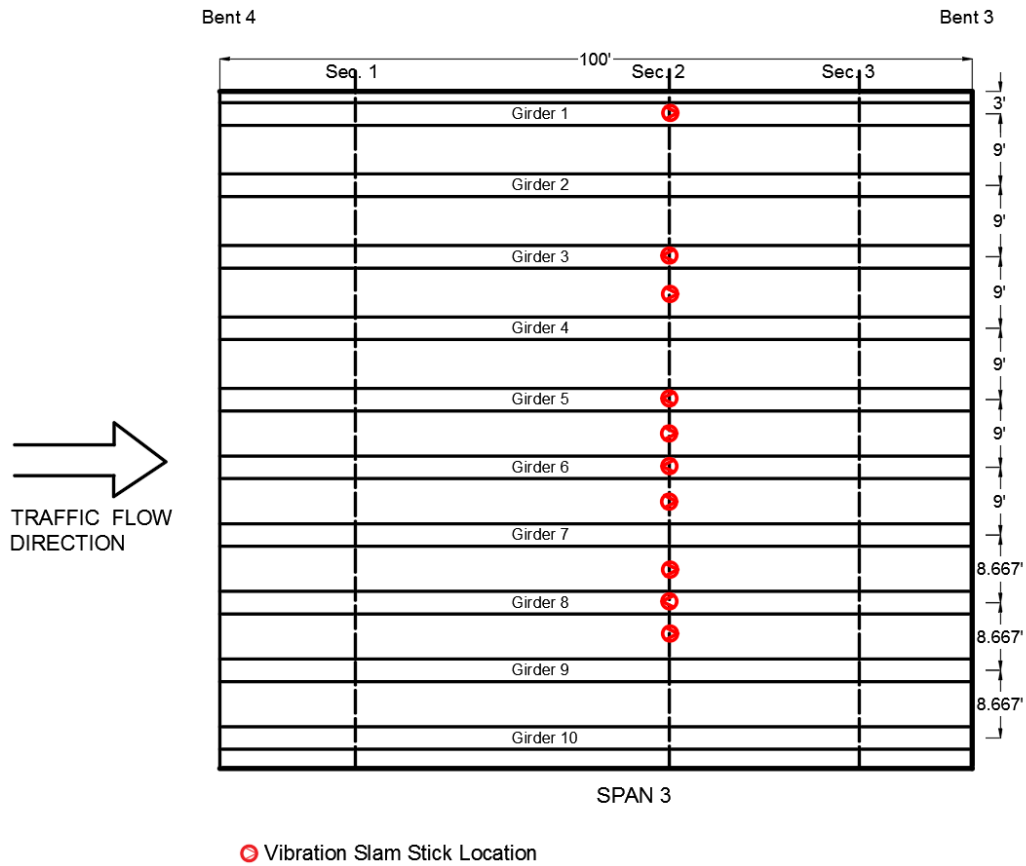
17: Locations of vibration meter under the deck and the girders for SB Bridge
